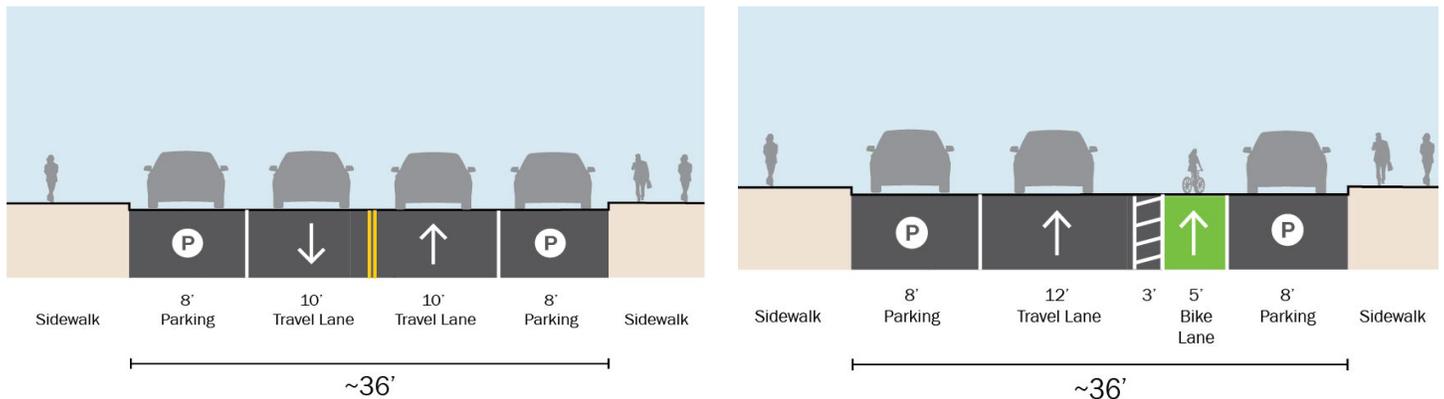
Existing and Recommended Cross Section of Pacific Street (looking north)
